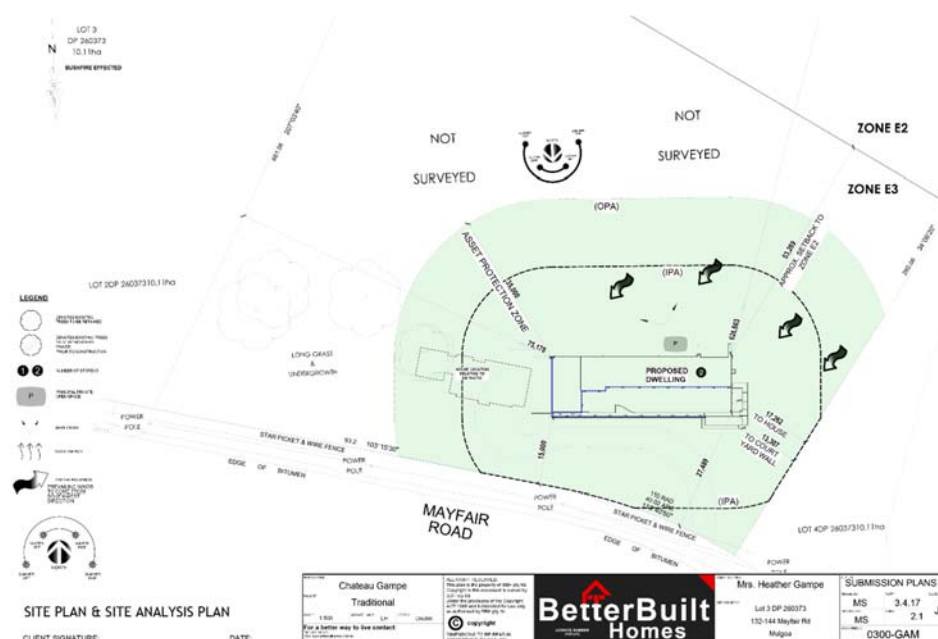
Site Plan for Lot 3 DP 260373 prepared by Better Built Homes 2017.
